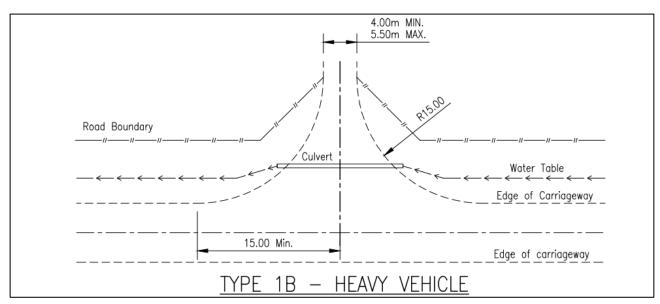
FNDC 2023 Engineering Standards 1B Crossing
